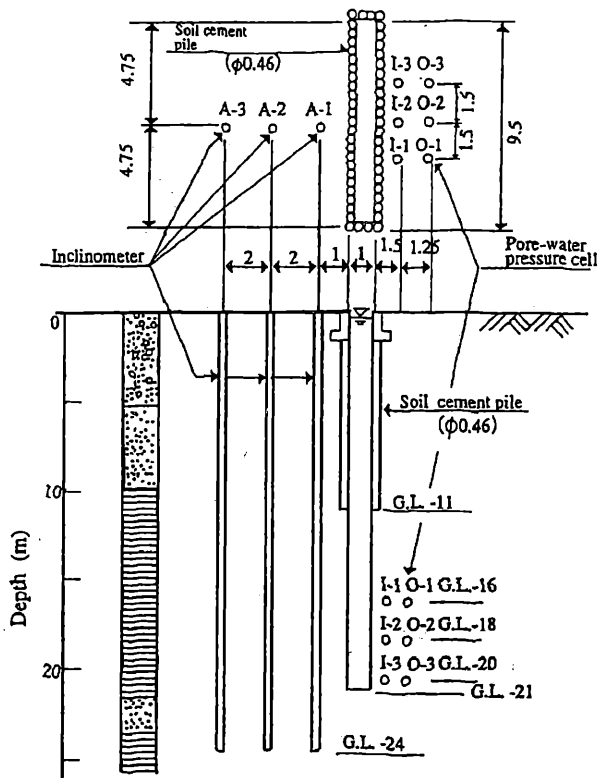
Experimental trench excavation (plan, cross section and location of measuring instruments).
